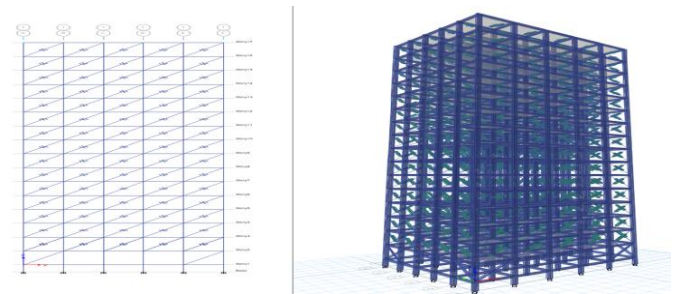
(G+15) storied building with infill wall and diagonal steel bracing with brick infill in open ground storey.
